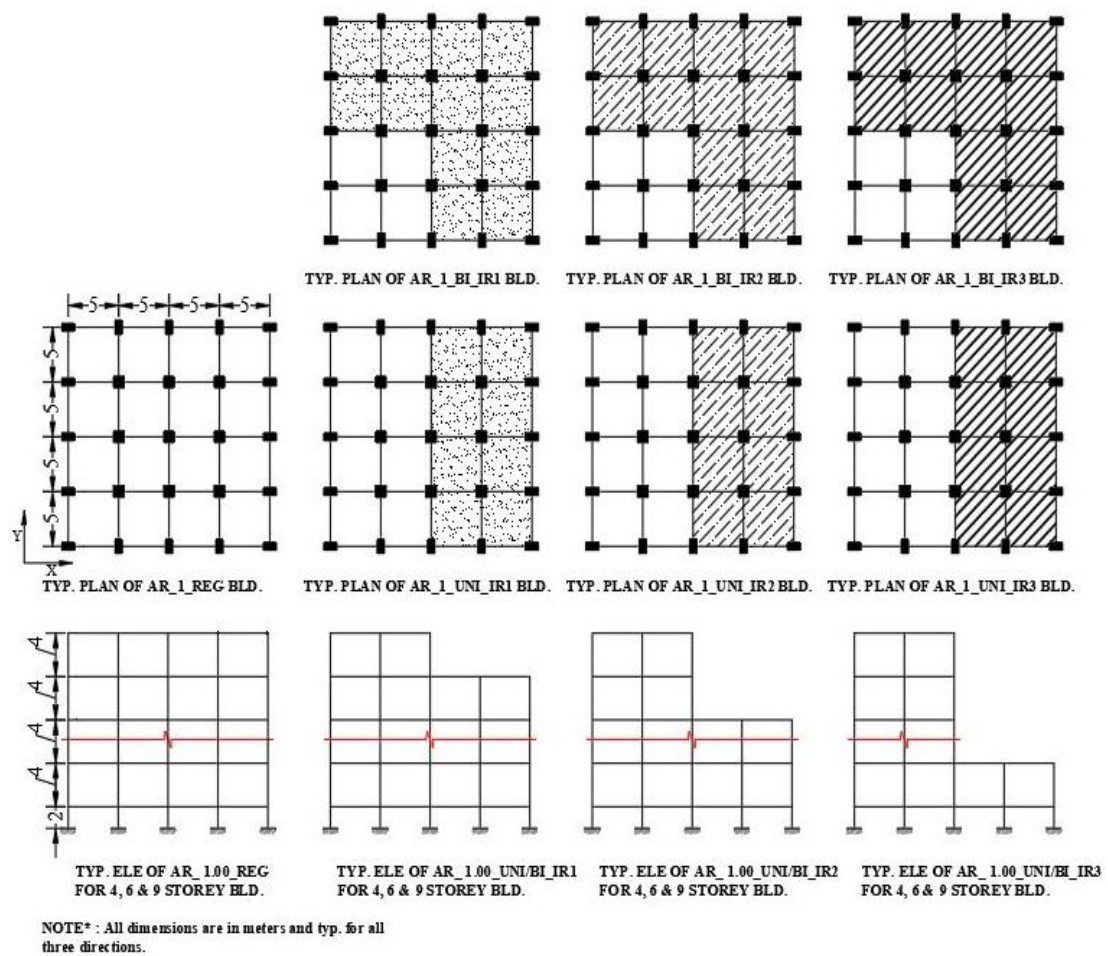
Typical plans and elevation with unidirectional and bidirectional setback
